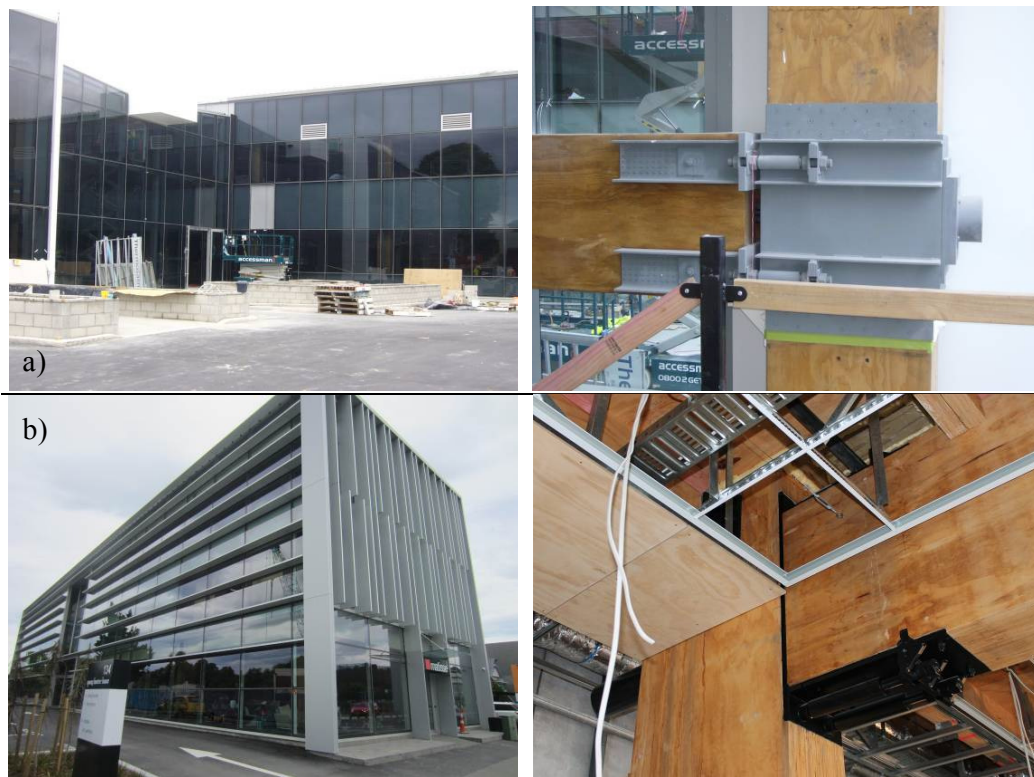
Applications of post-tensioned timber frames in construction a) the Trimble office building, b) the Merritt office building
